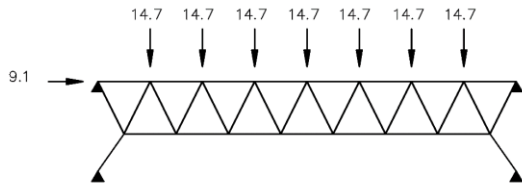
Bracing truss loading under LL combination in ULS (forces in [kN])
